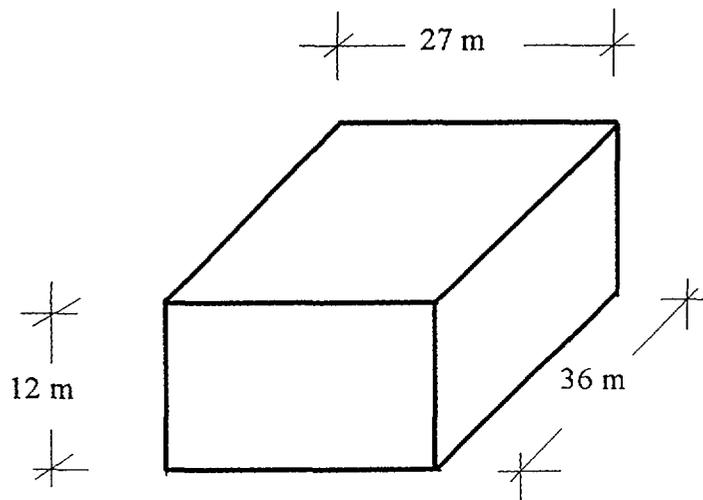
Reinforced concrete building with thick walls and slabs: Auxiliary building concrete block
